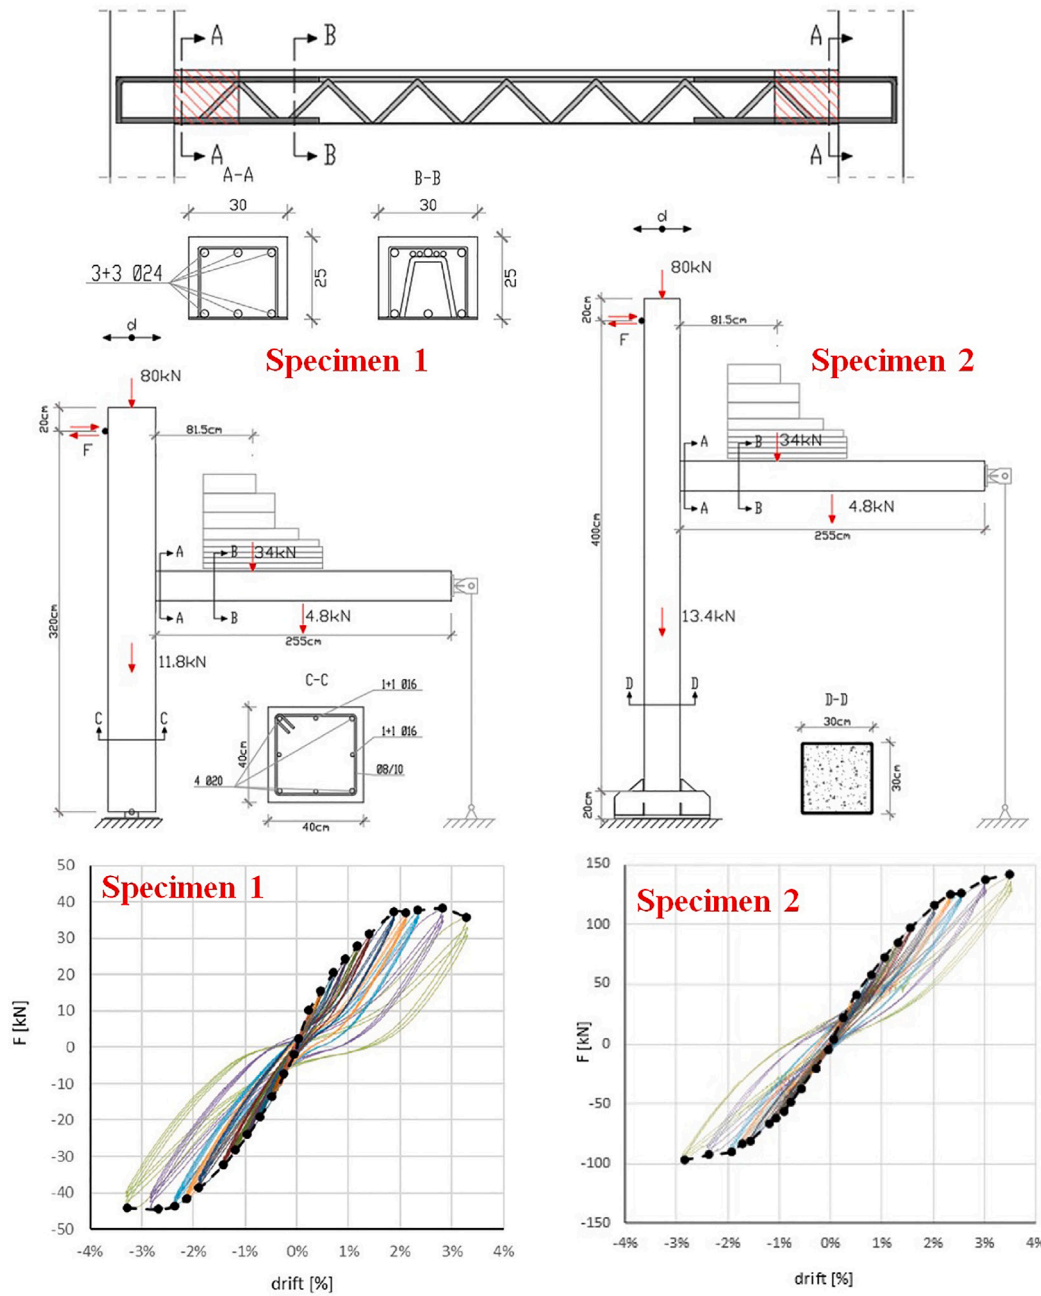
Specimens of the joints tested by Di Cesare et al. [82].
